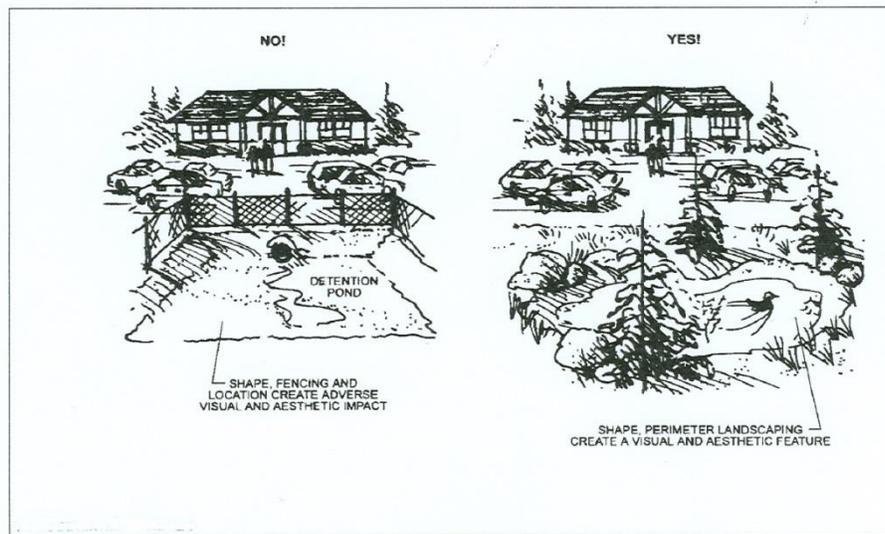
DETENTION AND STORMWATER FACILITIES
